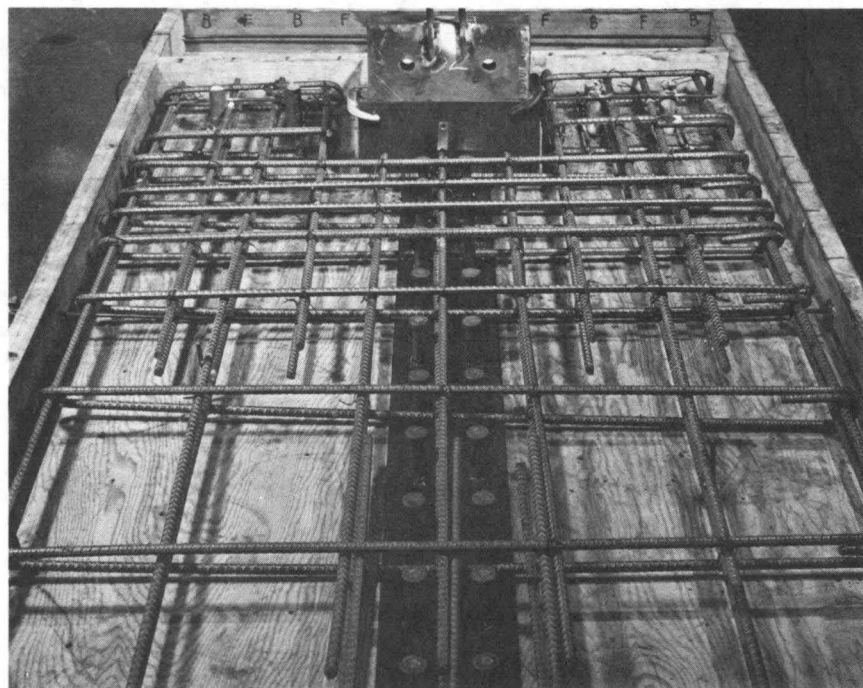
REINFORCEMENT DETAIL FOR BEAM WITH
